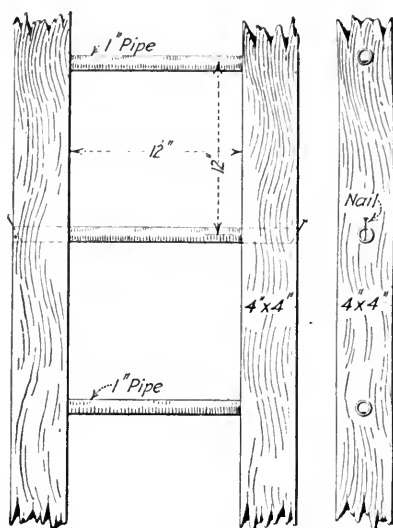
LADDER OF 4 X 4-IN. UPRIGHTS AND 1-IN. PIPE RUNGS.
